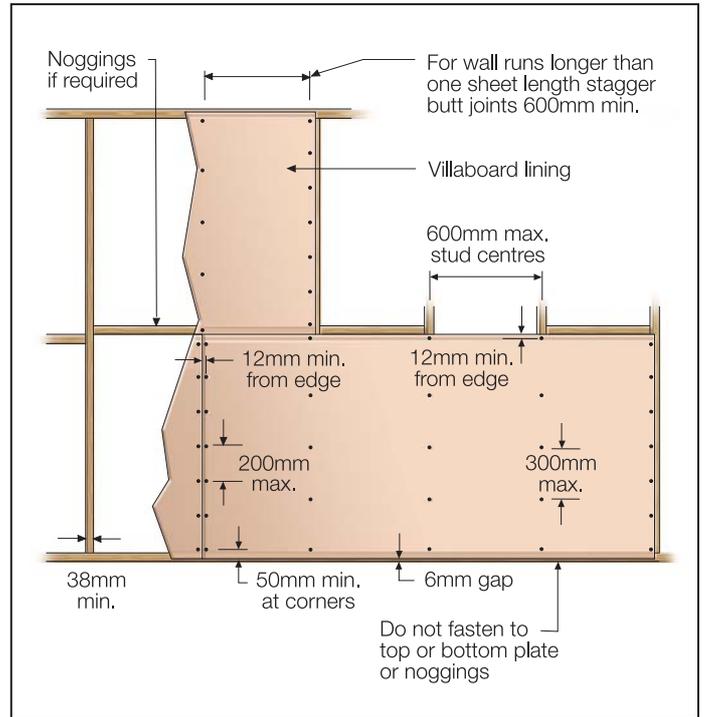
UNTILED FASTENING TO WALL FRAMES
